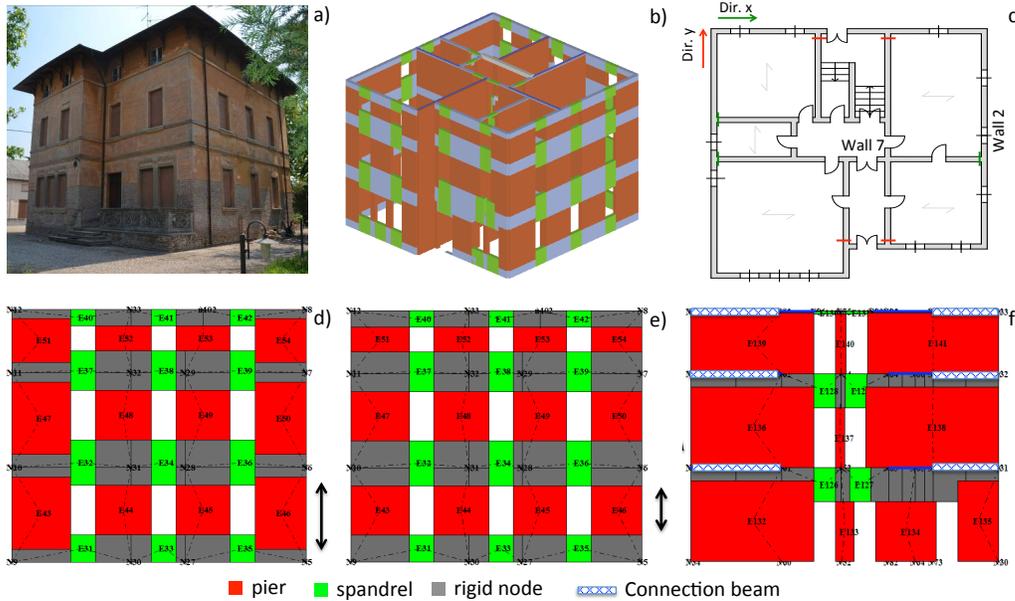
a) View of the real building; b) 3D equivalent frame model; c) plan view; d,e) two mesh options adopted (Wall 2); f) equivalent frame idealization of Wall 7 with the indication of beams adopted to simulate the effectiveness of walls to walls connection
